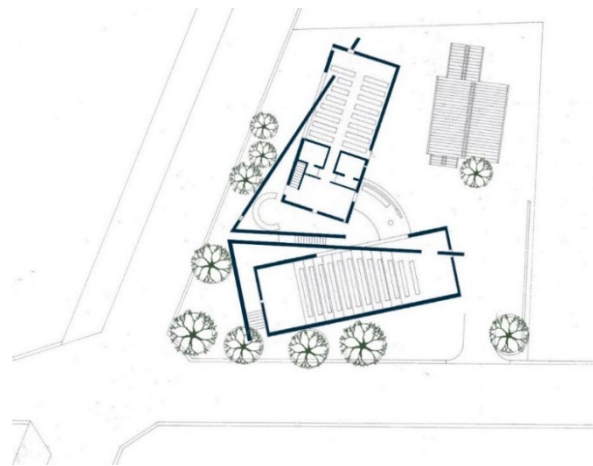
Ground floor plan of the building (Reproduced from ArchEyes (n.d.) by the first author)
